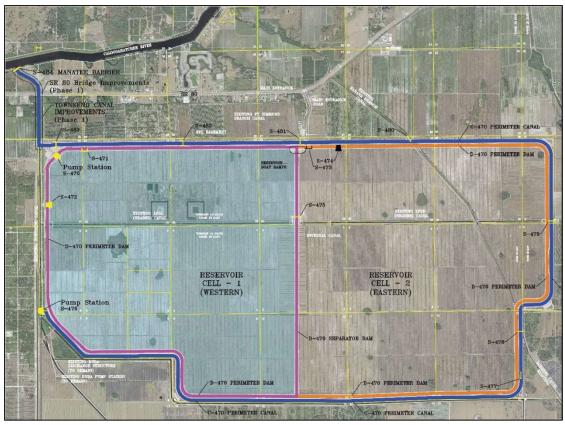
Caloosahatchee River (C-43) West Basin Storage Reservoir site plan.
